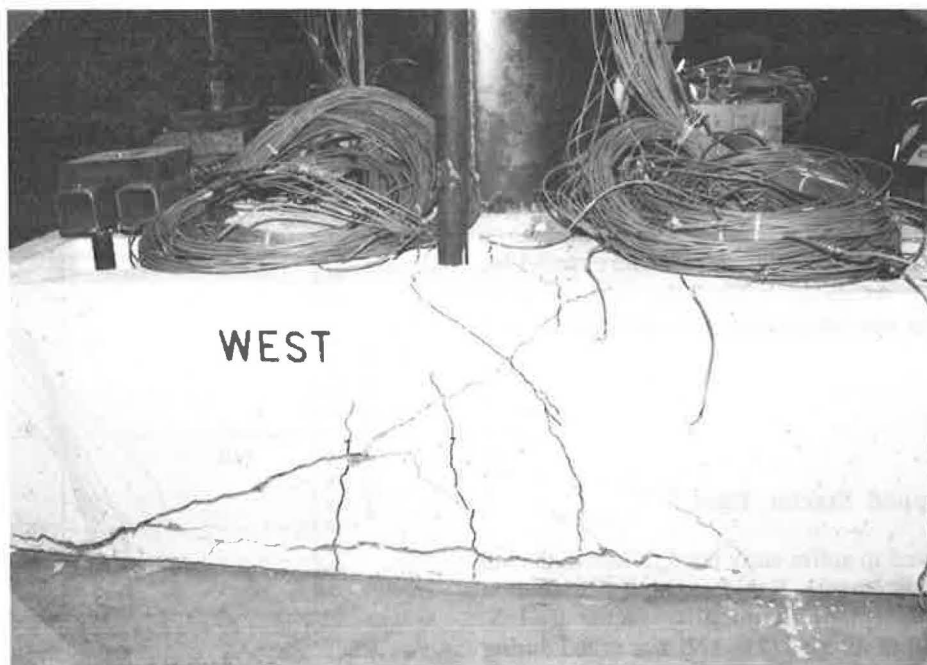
Joint Shear Failure in Weak Footing - Column 2
